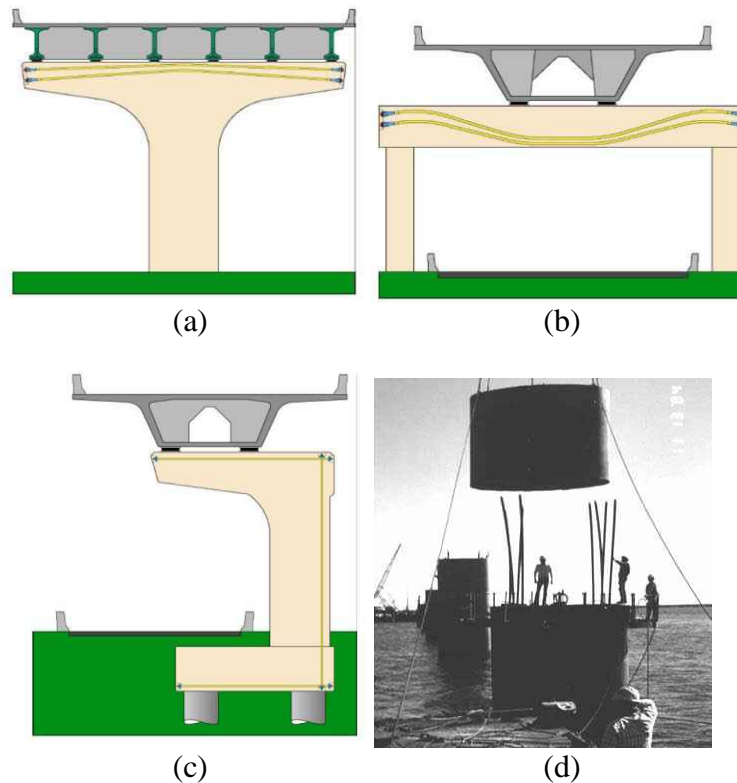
Options for using post-tensioning in substructure construction (a) hammer head piers (b) straddle bent (c) cantilever pier (FDOT 2002-1) (d) segmental pier (Garcia P. and Theryo T. 2006)
